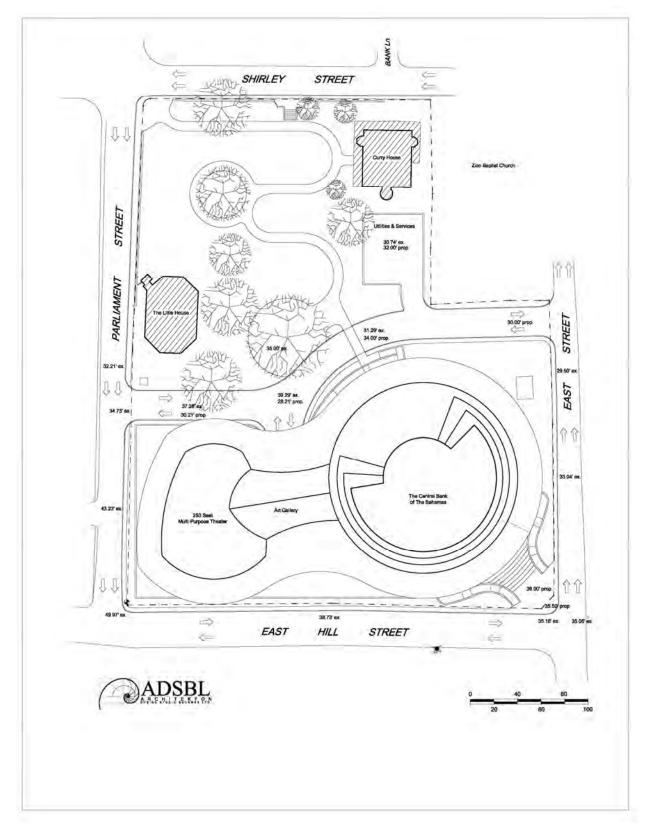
(The New Central Bank of the Bahamas Proposed Site)
